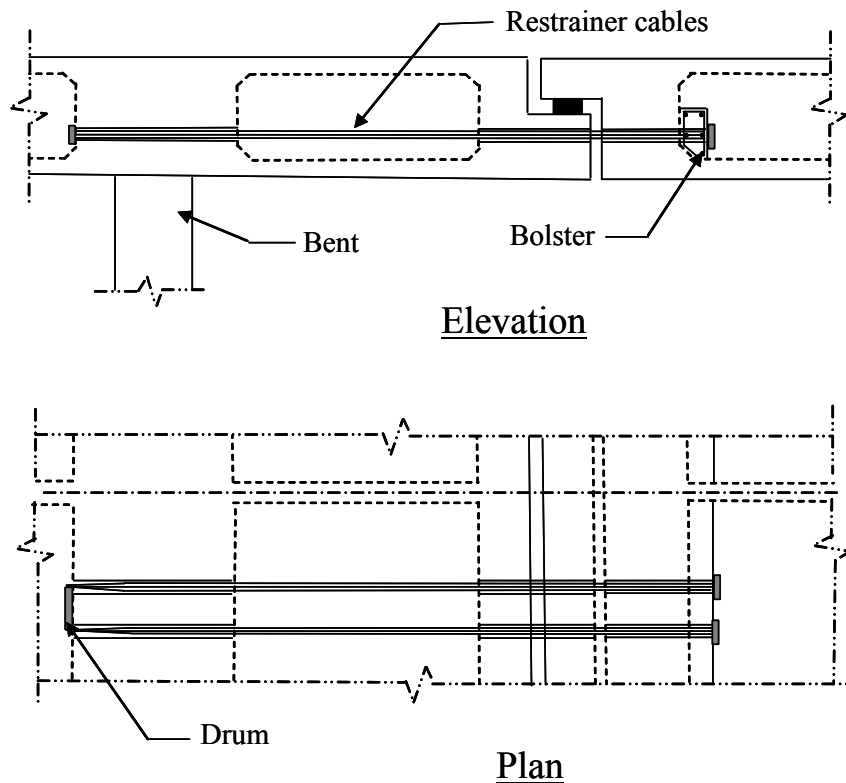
Common used configuration for steel restrainer cables in multiple frame bridges.
